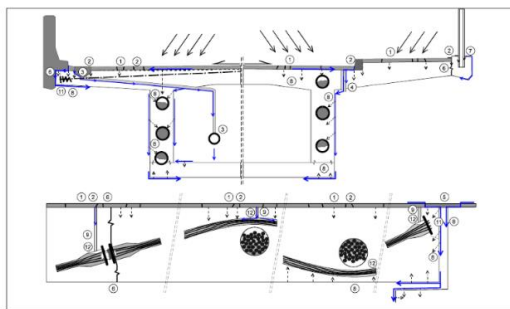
Hazard scenarios for prestressing steel in a typical box girder bridge: Indication of potentially “weak points” where water (possibly contaminated with chlorides) can gain access to the tendons and cause corrosion
